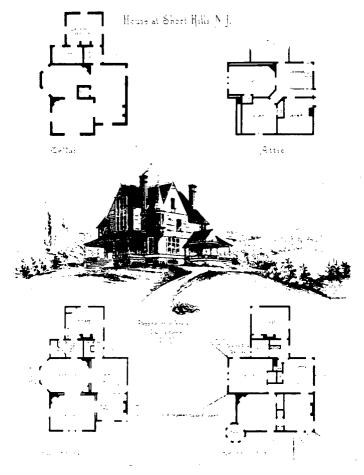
Lamb and Wheeler, House at Short Hills, N. J., Plate 45 (Comstock, Modern Architectural Designs, 1881).
